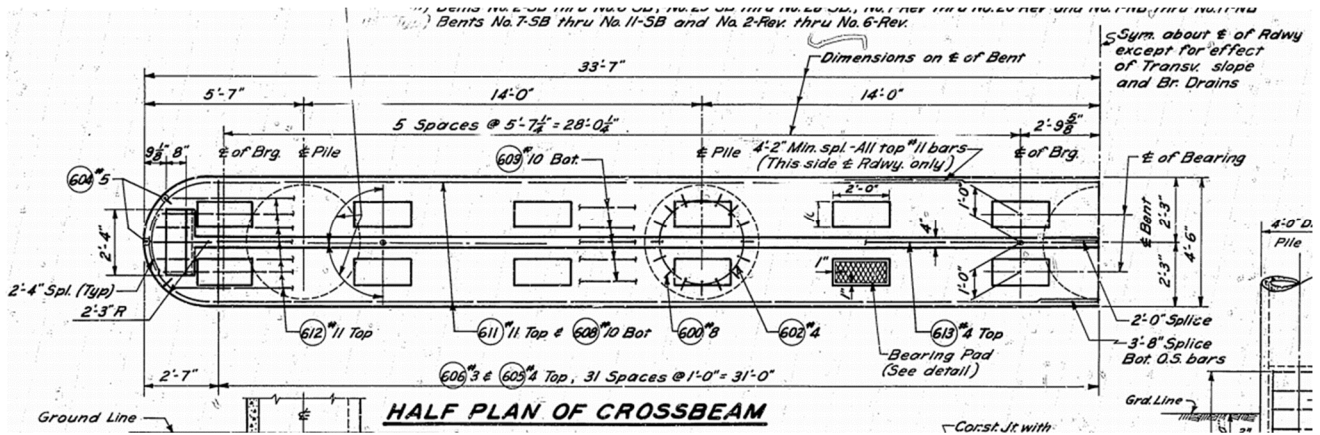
Plan view of Cap Beam for Typical Bent (Galer-Lakeview)
